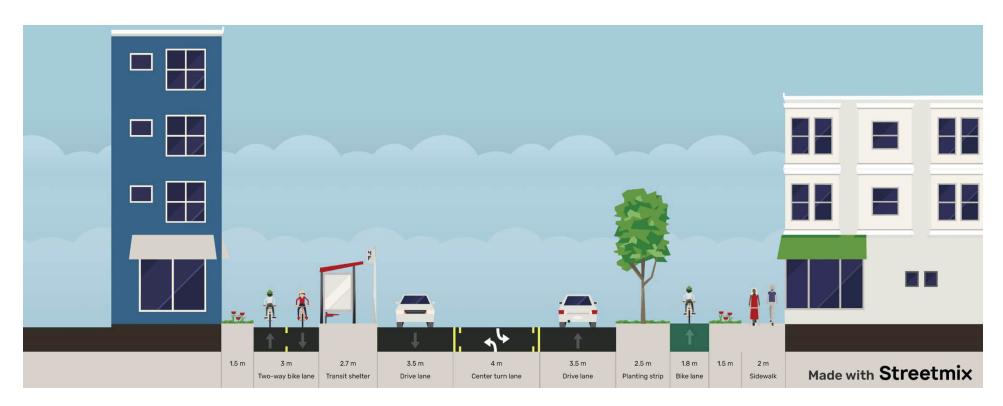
Arterial (26 m Right-of-Way) with TWLTL
